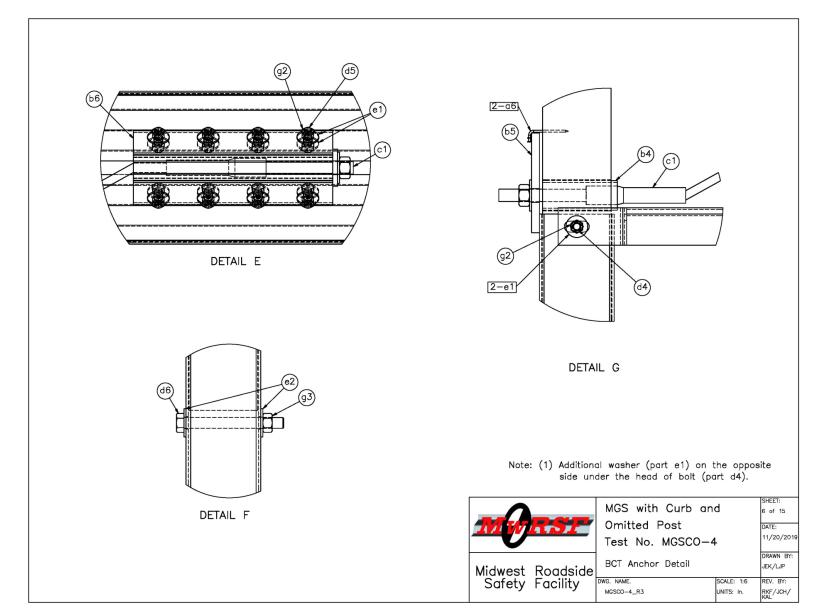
MGS End Anchorage Details, Test No. MGSCO-4
